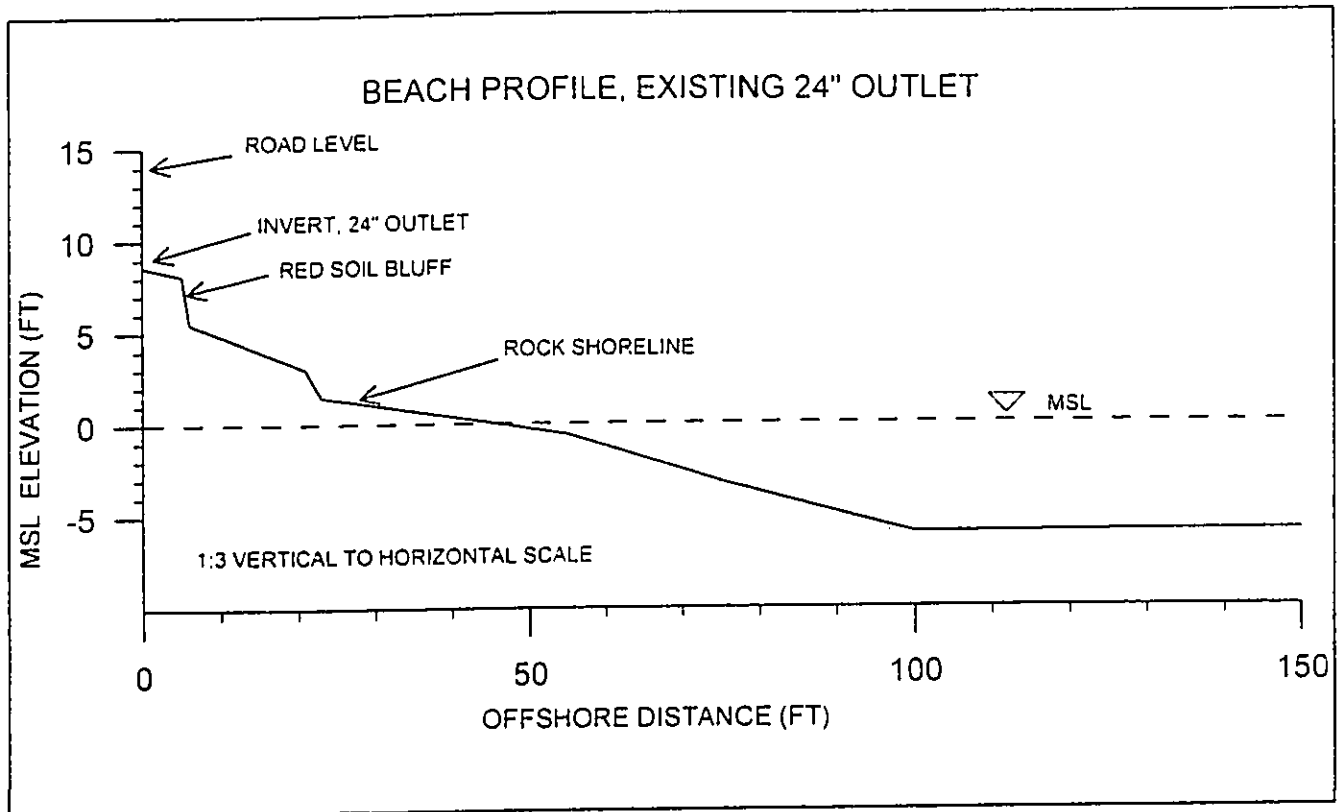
Cross-shore profile at the location of the existing 24-inch outlet.
